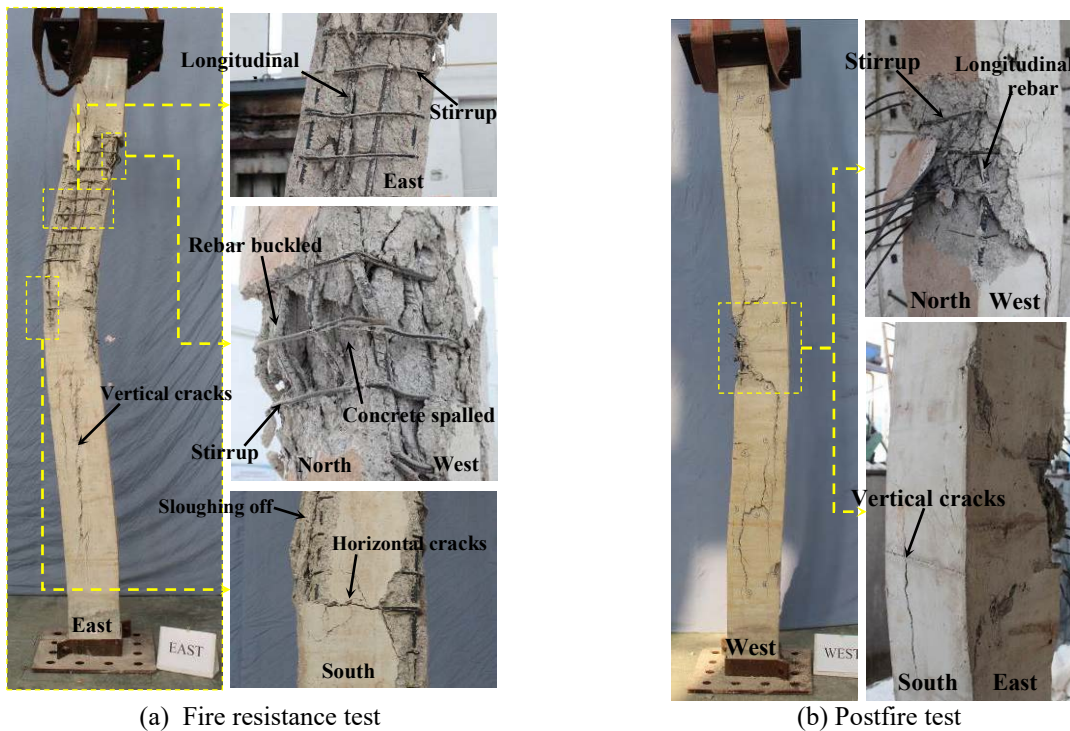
Failure modes of concrete-encased CFST column in fire tests.
